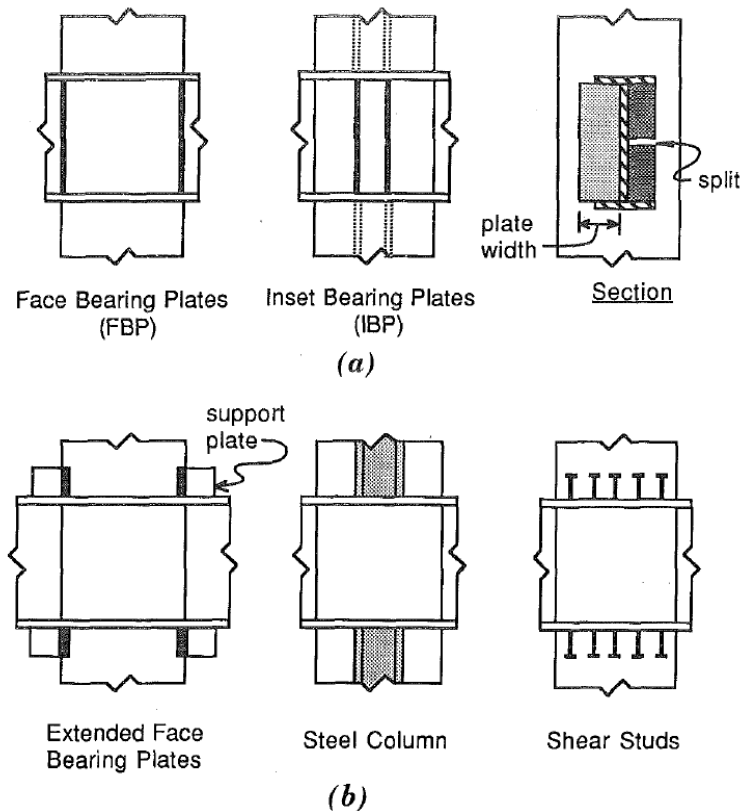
(a) Bearing (Stiffener) Plate Details; (b) Extended FHP, Steel Column, and Shear Stud Details (Sheikh, Deierlein et al. 1989)
